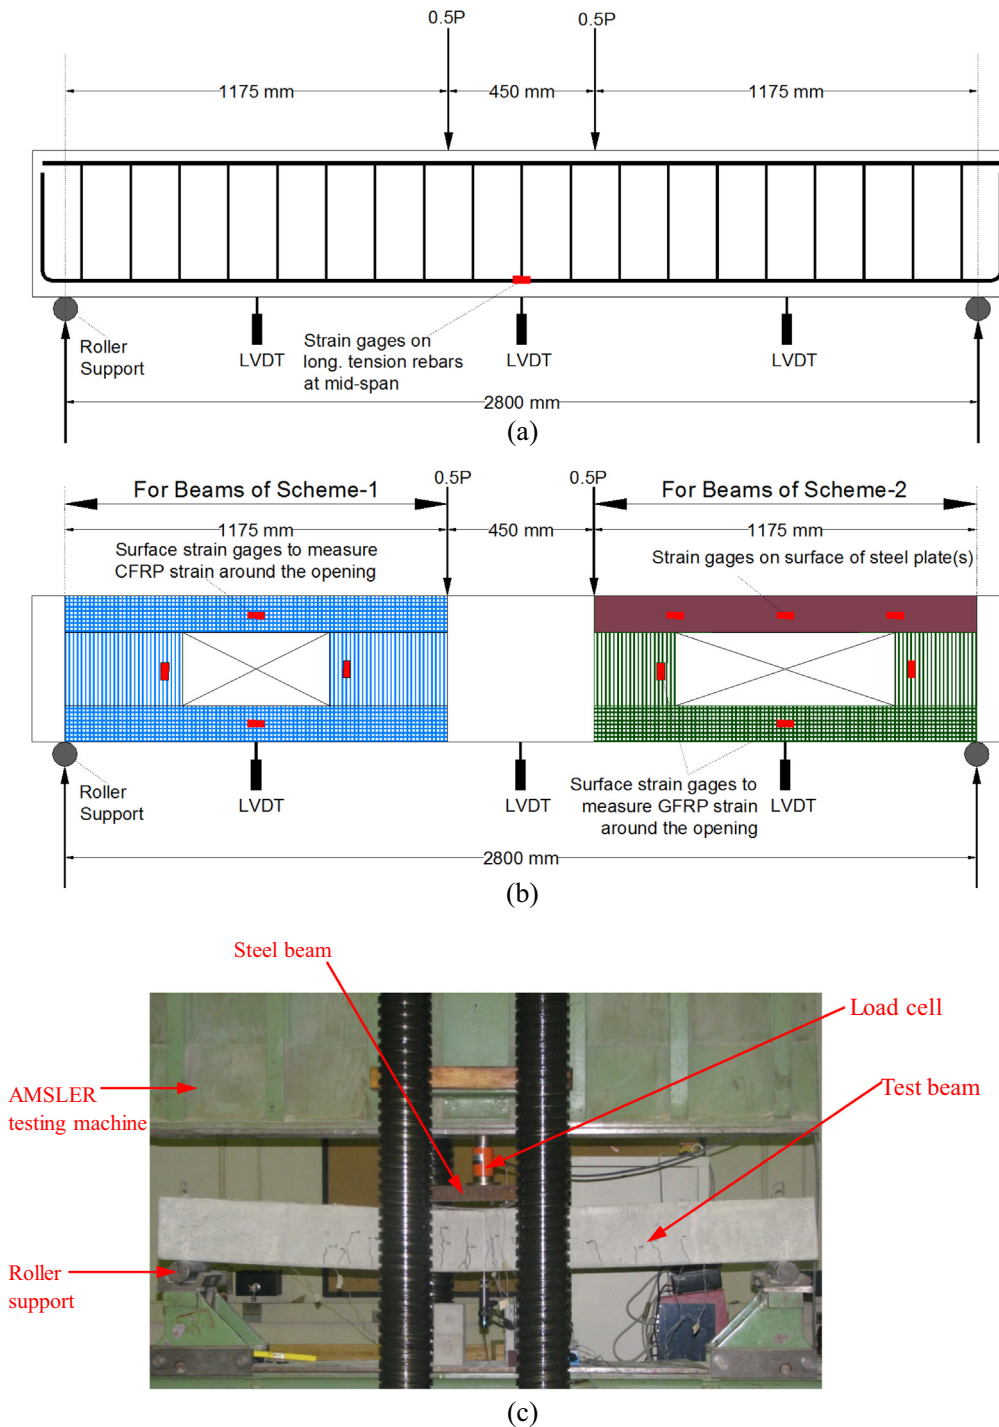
Instrumentation layout and test setup: (a) Sensor locations for unstrengthened beams; (b) Sensor locations for strengthened beams; (c) Test setup.
